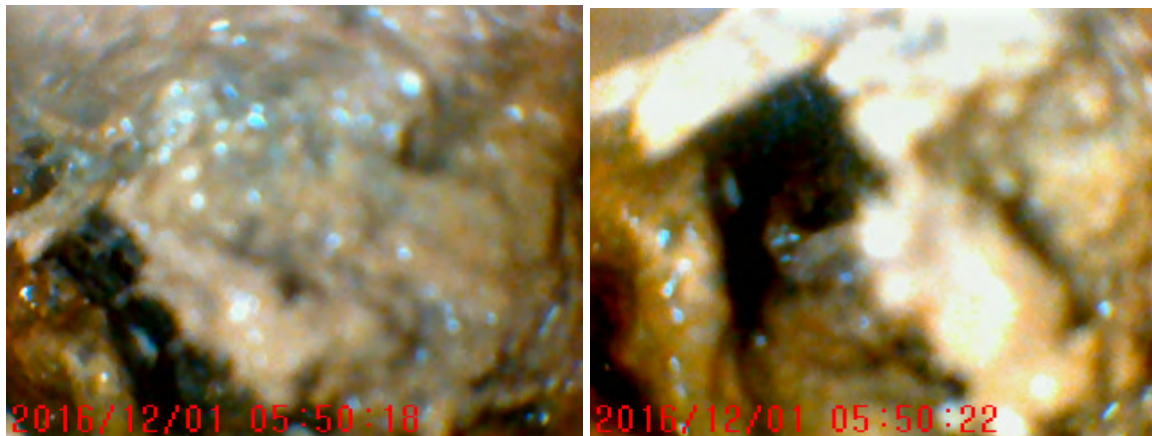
Videoscope evaluation at conduit exiting top of 3rd level electrical panel; interior was very wet with water dripping from conduit.
